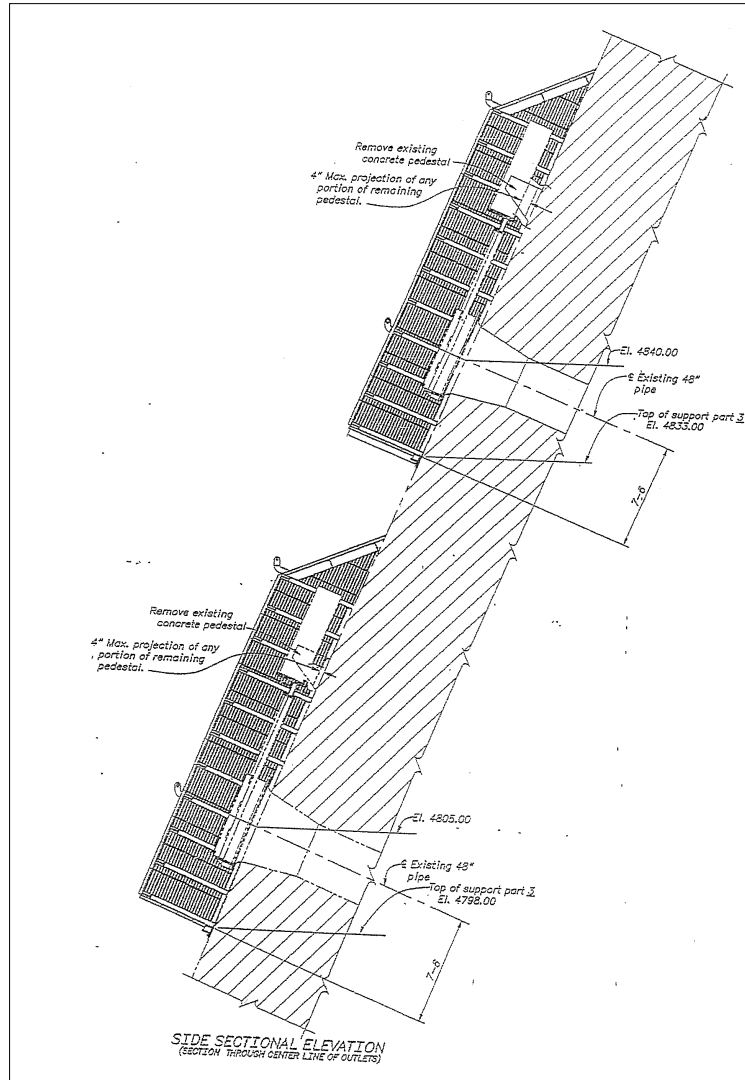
Three-sided integral trashracks for dam outlet works.
